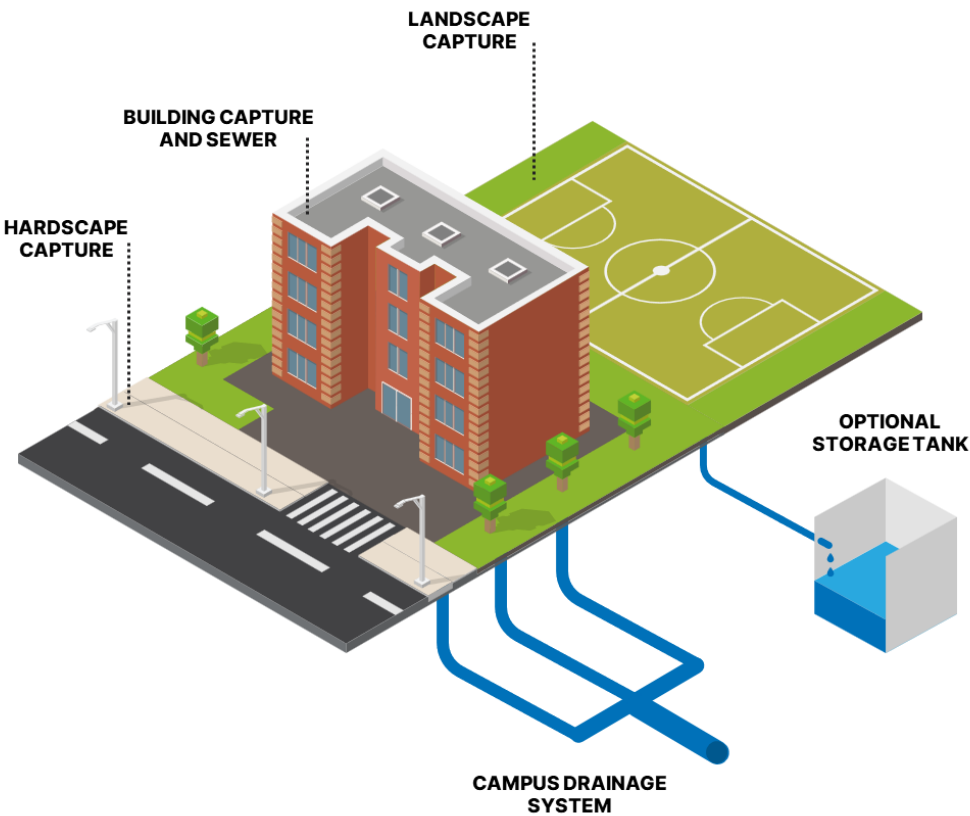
Example Storm Drain, Stormwater, and Sanitary Sewer Infrastructure
